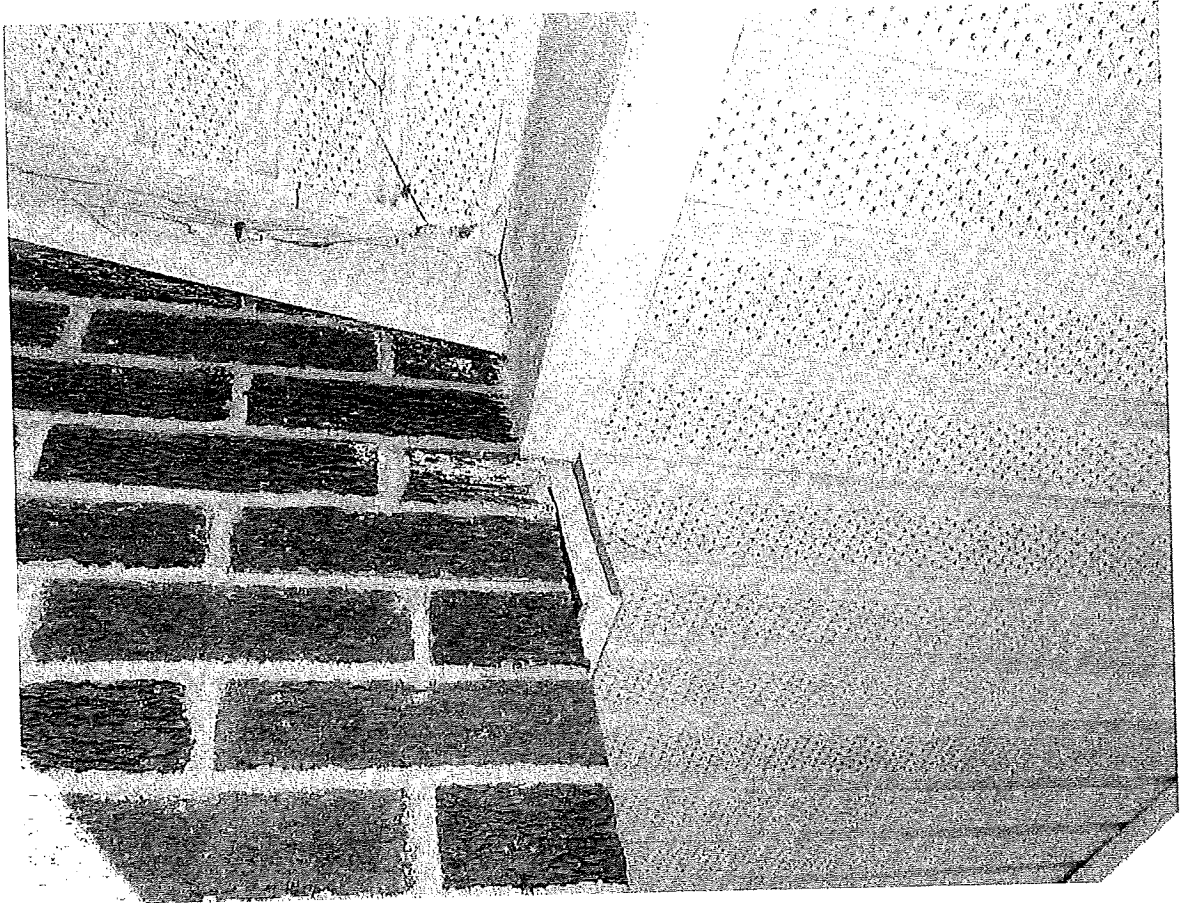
Exposed Edge of Wood Trim Board – Side A (left)
